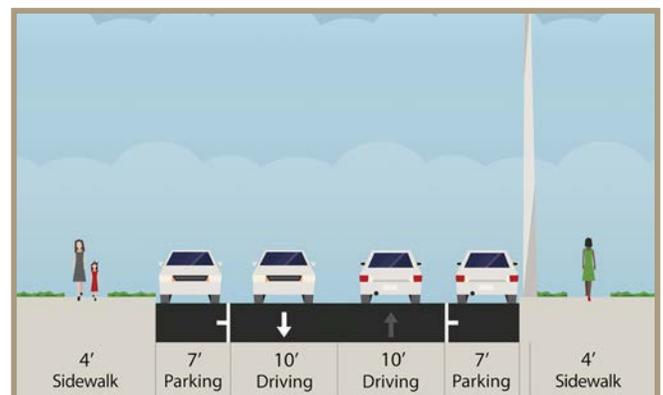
Looking east on Spruce Avenue west of Center Street, existing conditions.
